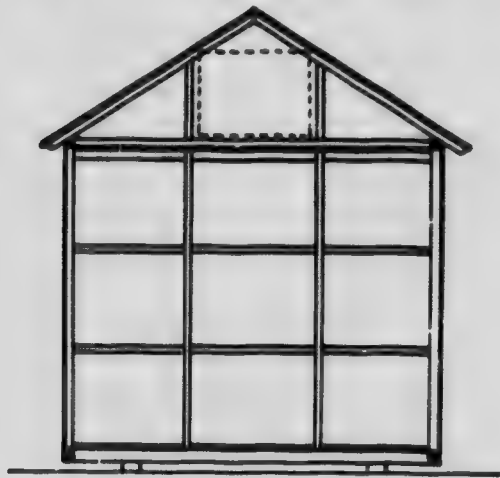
COLONY LAYING HOUSE CONSTRUCTION.
